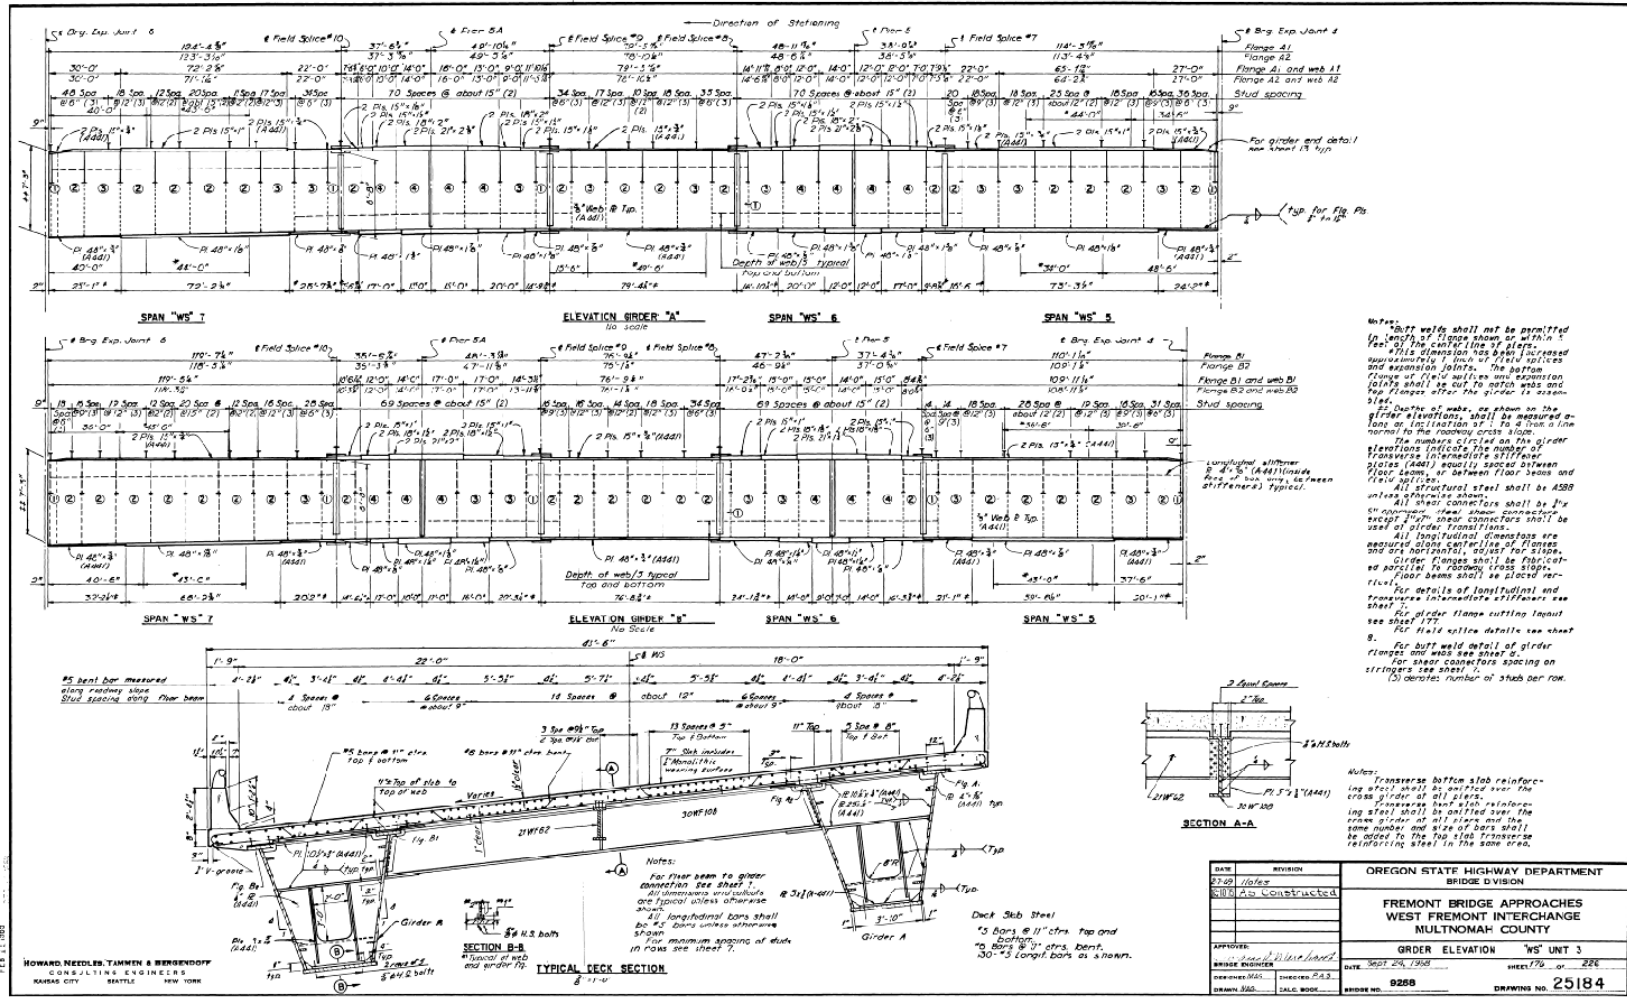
Structural details of WS Unit 3 Bridge superstructure 09268B.
